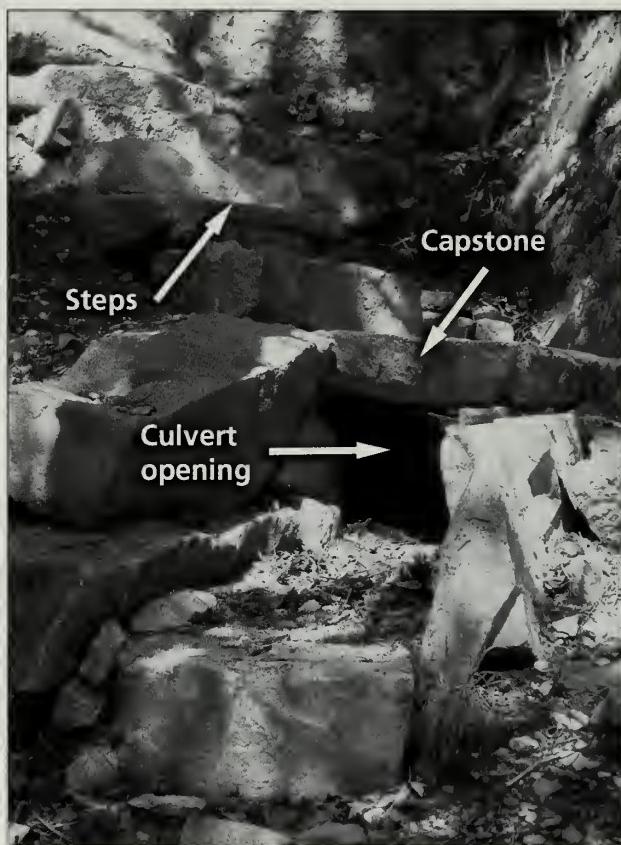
This repair of a washed-out section on the Pond Trail (#20) consists of a closed capstone culvert incorporated into a stone stairway. It was constructed by NPS crews in 1995.
